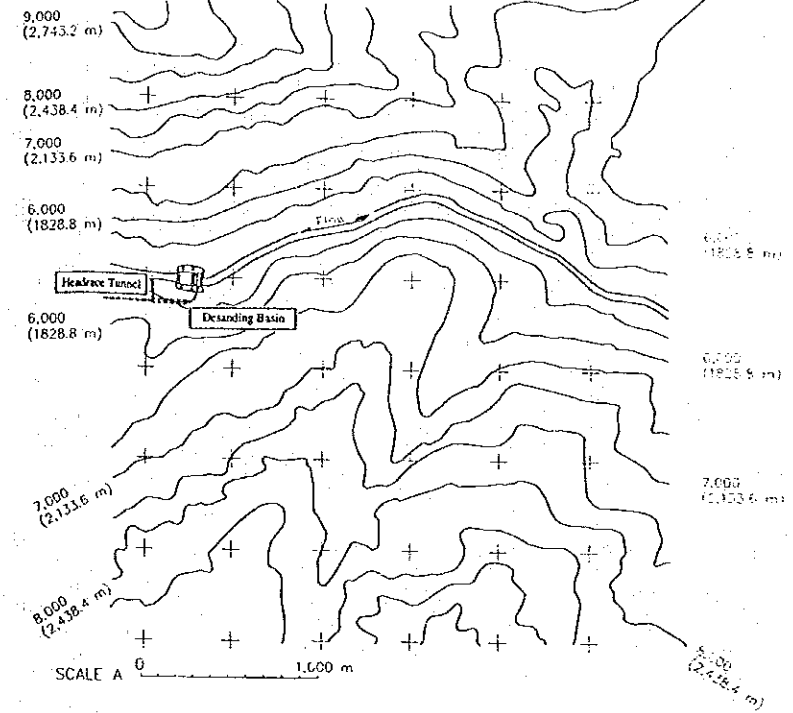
Preliminary Plan of HKR-4 Scheme
